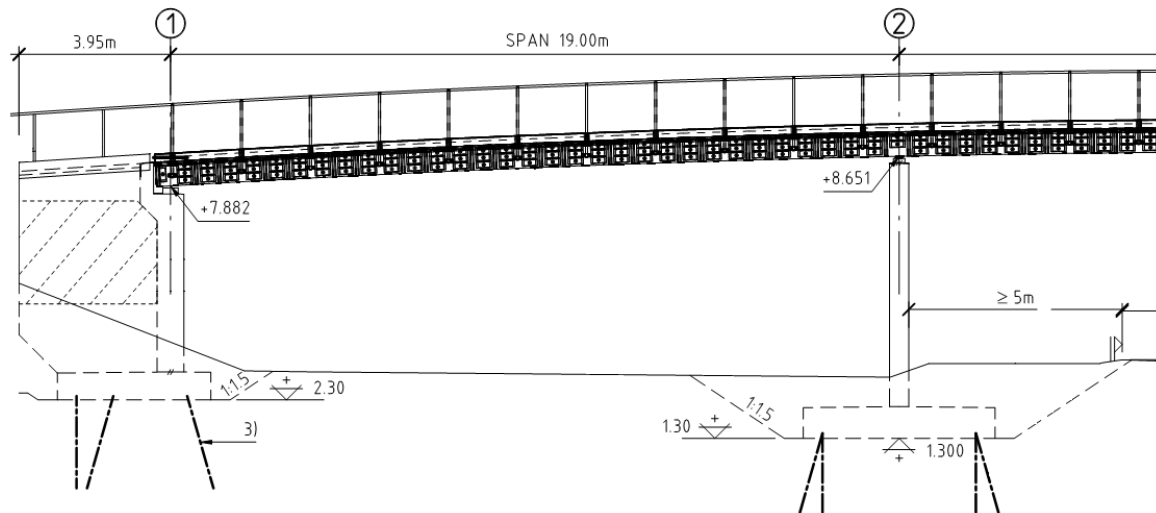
Elevation of half of the pedestrian bridge showing abutment (1) and mid support (2). Figure adapted from Kristianstad Municipality (2019).
